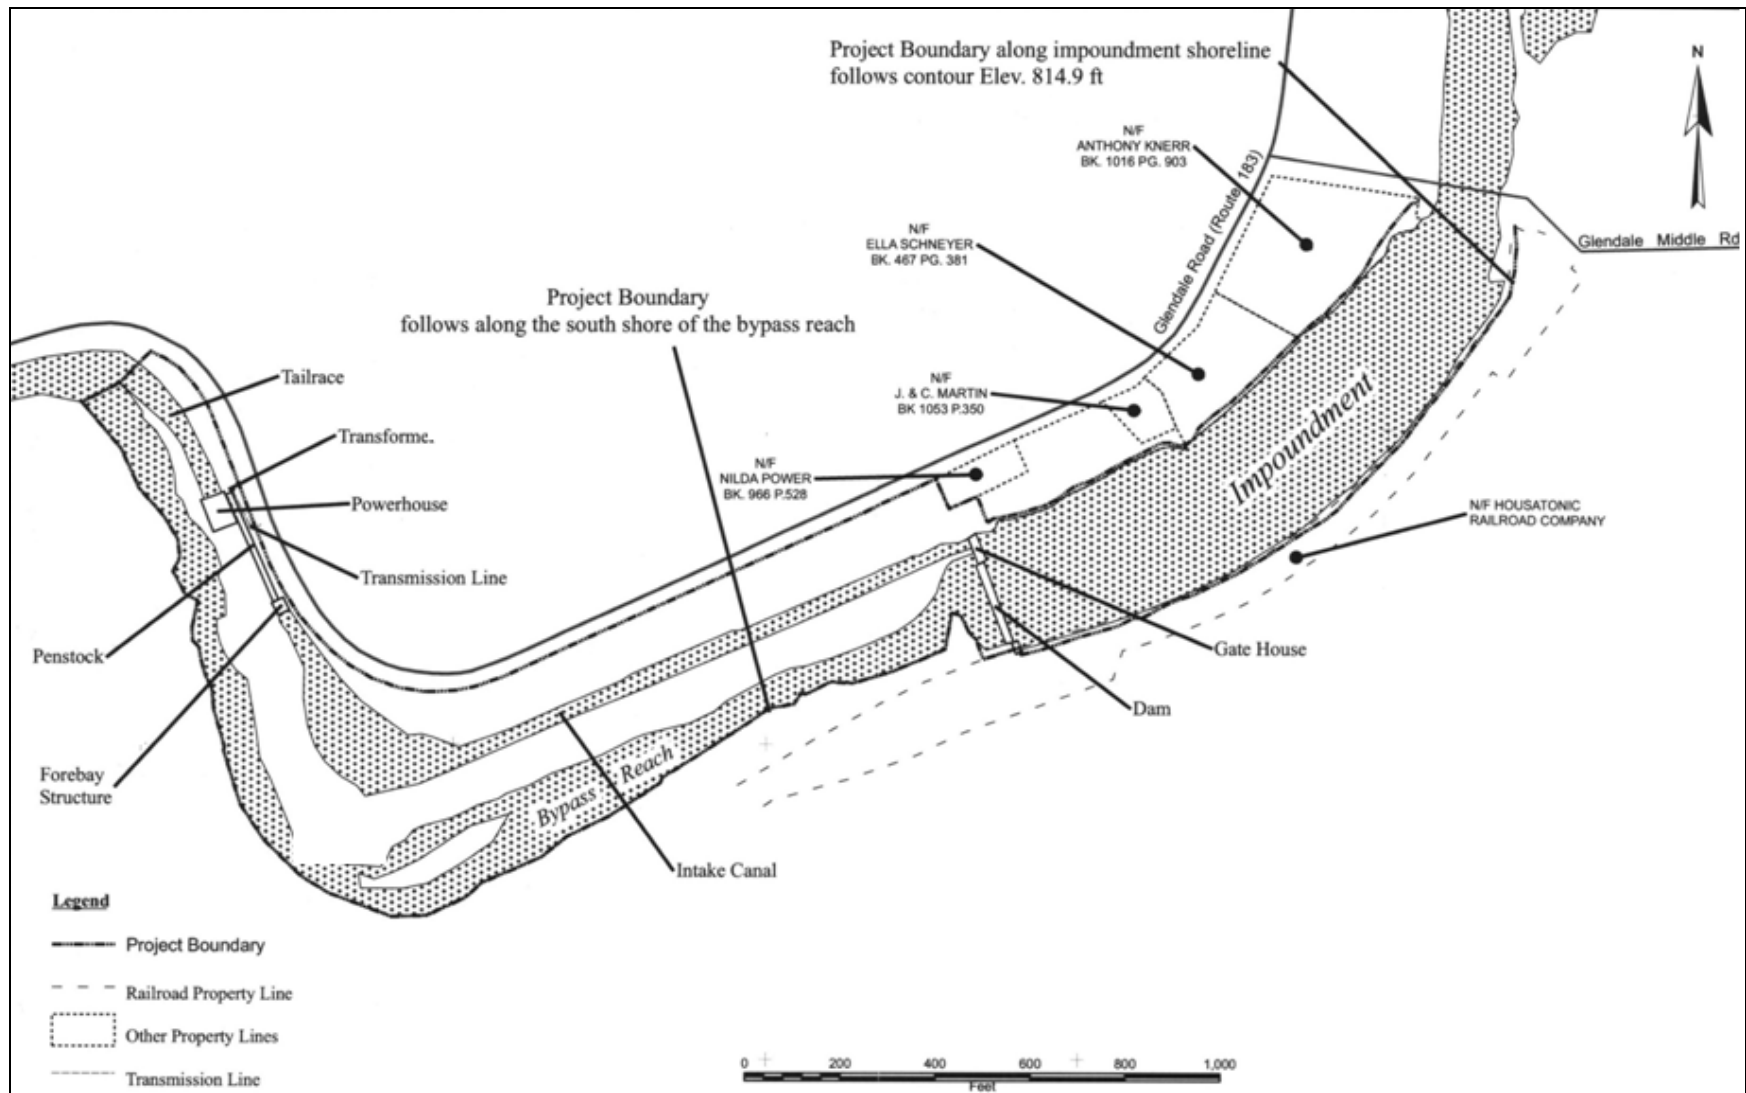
Glendale Project Site Plan. Source: License application, adapted by staff
